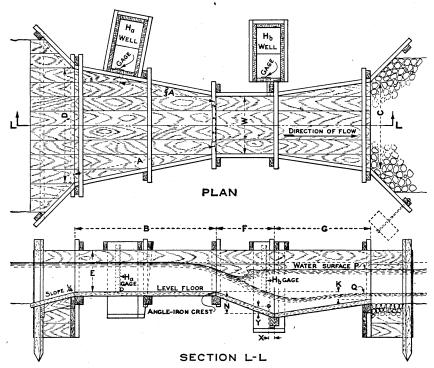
Plan and elevation of the Parshall measuring flume showing dimensions of W, size of flume, in inches or feet; A, length of side wall of converging section; 2/3 A, distance back from end of crest to gage point; B, axial length of converging section; C, width of downstream end of flume; D, width of upstream end of flume; E, depth of flume; F, length of throat; G, length of converging section; K, difference in elevation between lower end of flume and crest; N, depth of depression in throat below crest; X, horizontal distance to H_b gage point upstream from lower edge of throat; Y, vertical distance to H_b gage point from low point in throat. See table 5 for actual dimensions for various sizes of flume.
